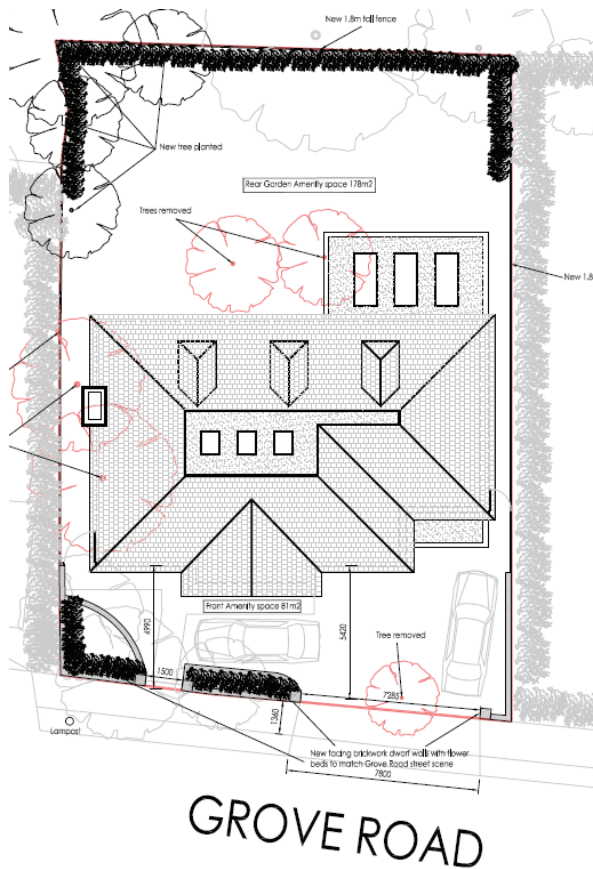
Proposed Site Plan of previous application ref. 21577/APP/2020/1792, refused and dismissed on appeal.
